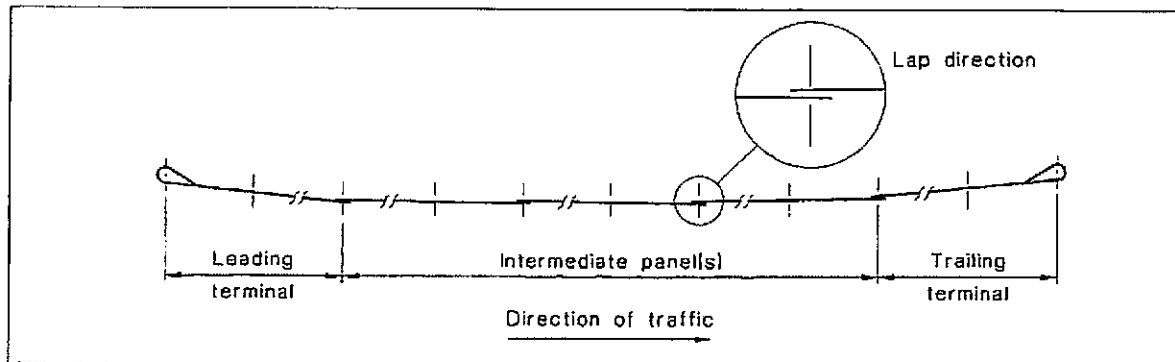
Typical safety barrier layout – plan view (AS3845:1999)
